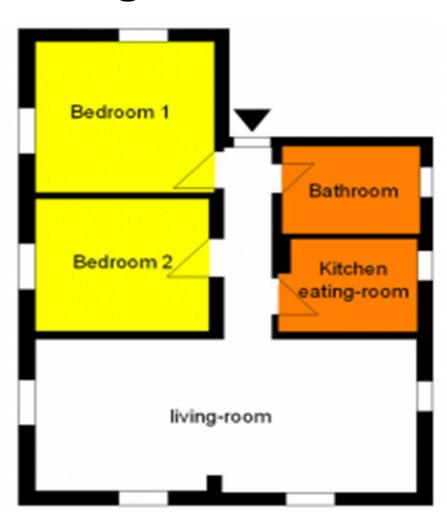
Examples of floor plans in which extended cascade ventilation can be used effectively.
